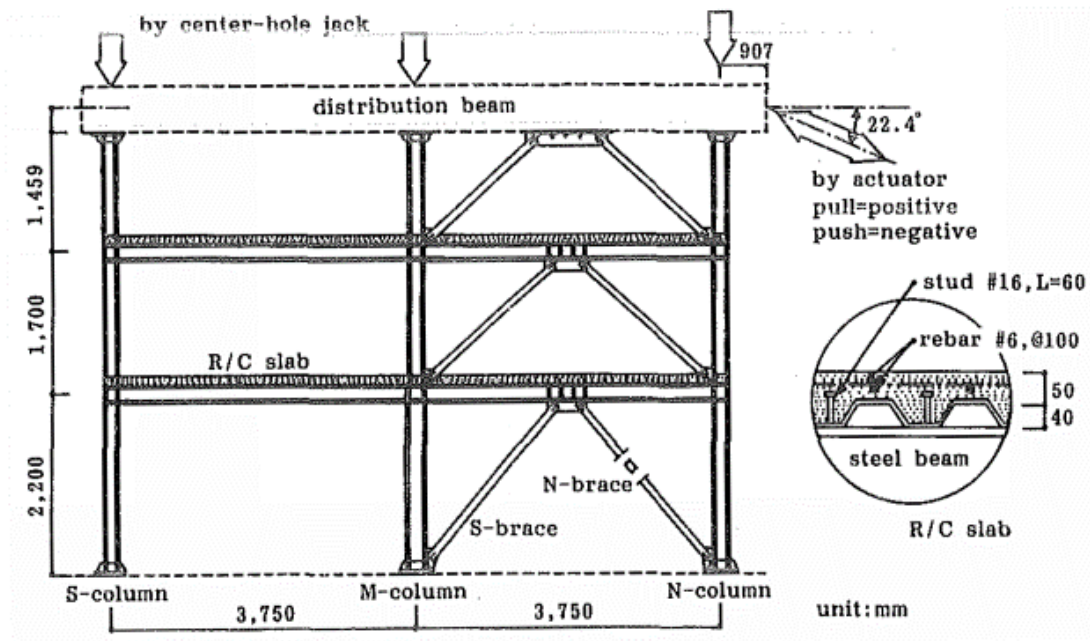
Elevation and loading details in three-story US/Japan tests (Fukuta et al. 1989)
